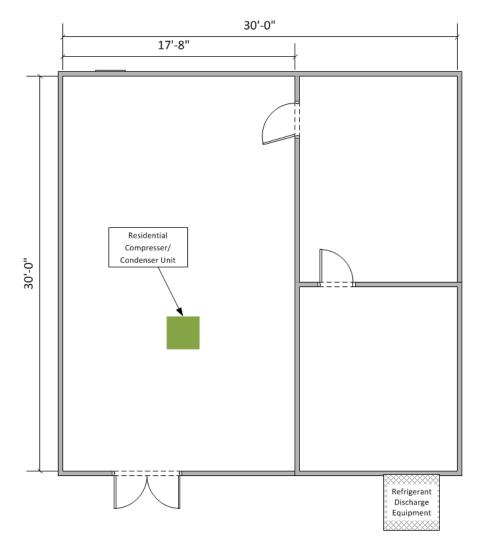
Hermetic Electrical Pass-Through Terminal Failure Test Setup
